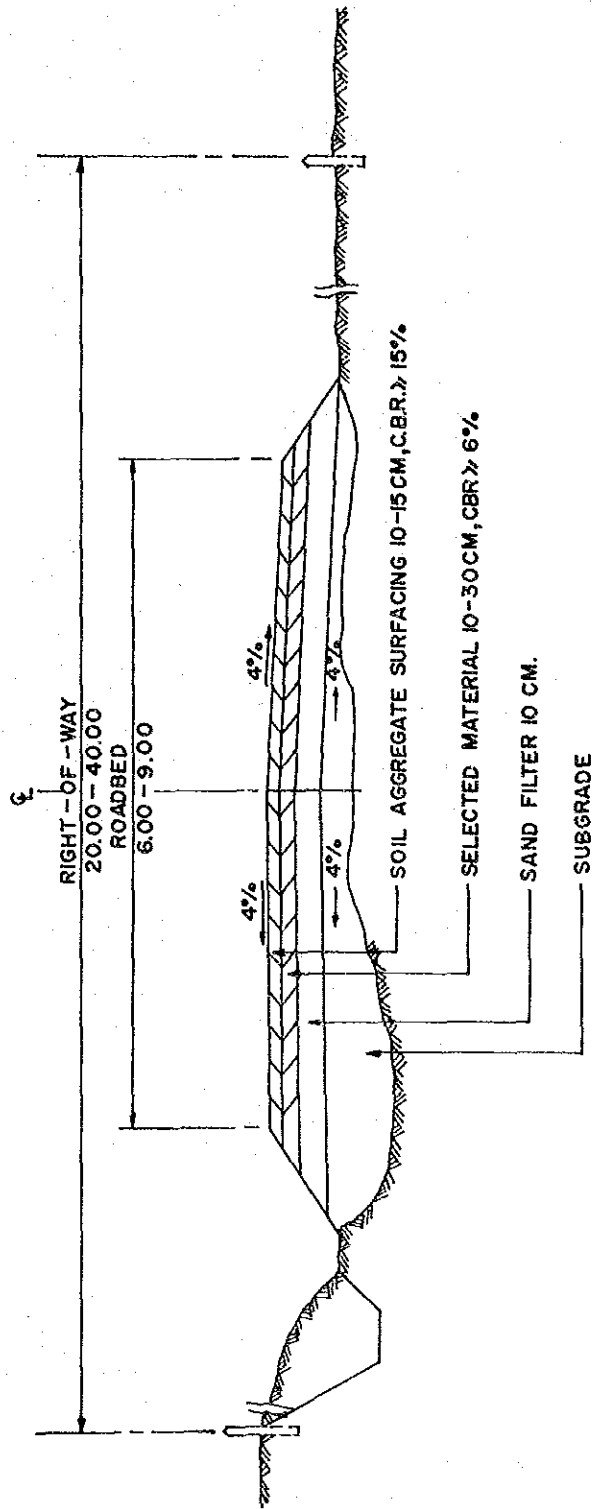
TYPICAL CROSS SECTION OF PROVINCIAL HIGHWAY (UNPAVED)
